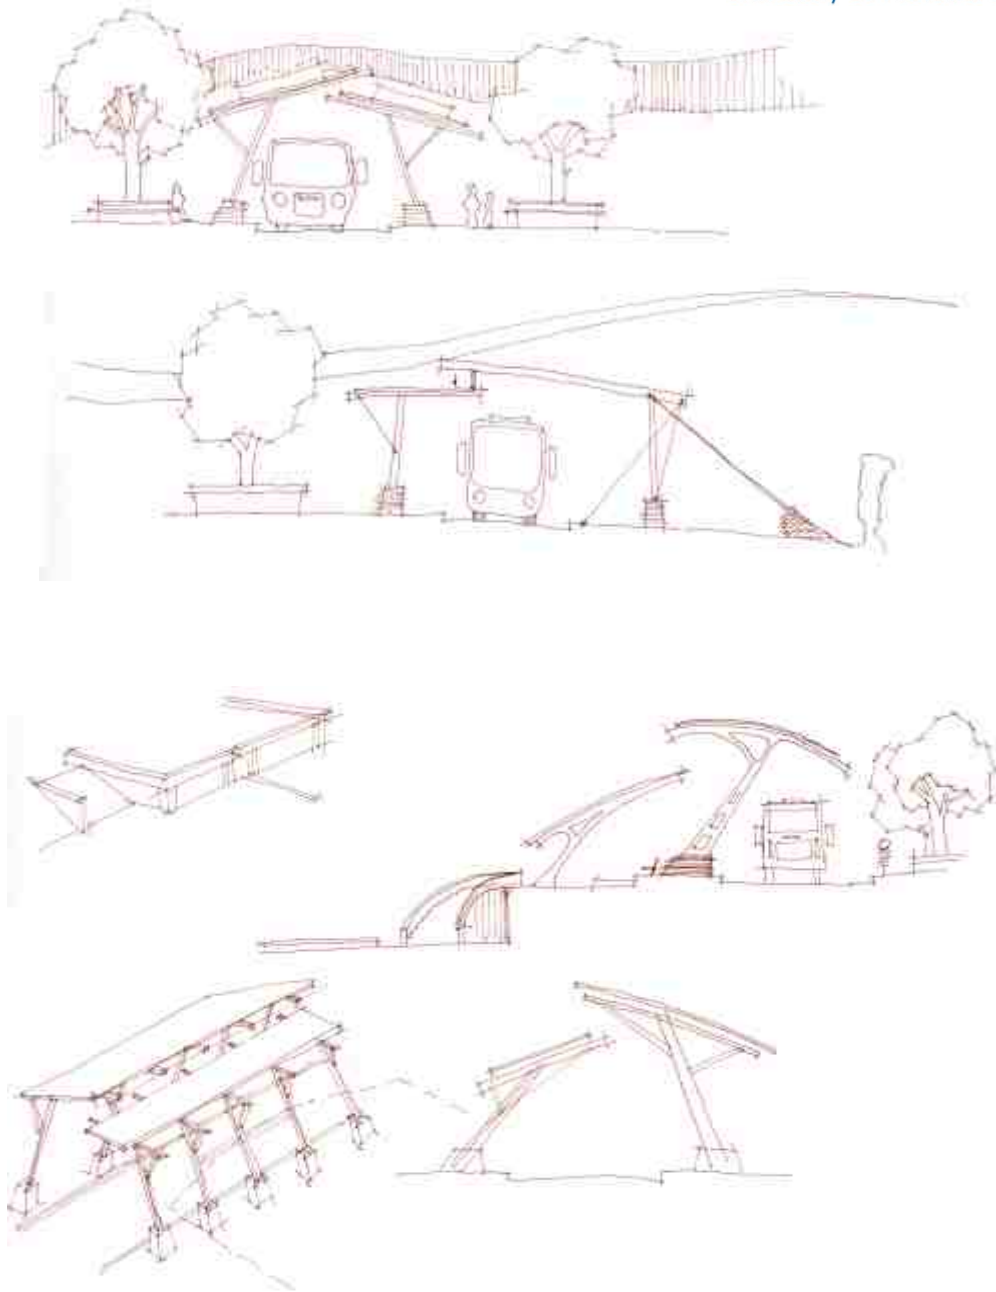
Early design sketches of Kiss-and-drop pavilions suggested flat roofs .
